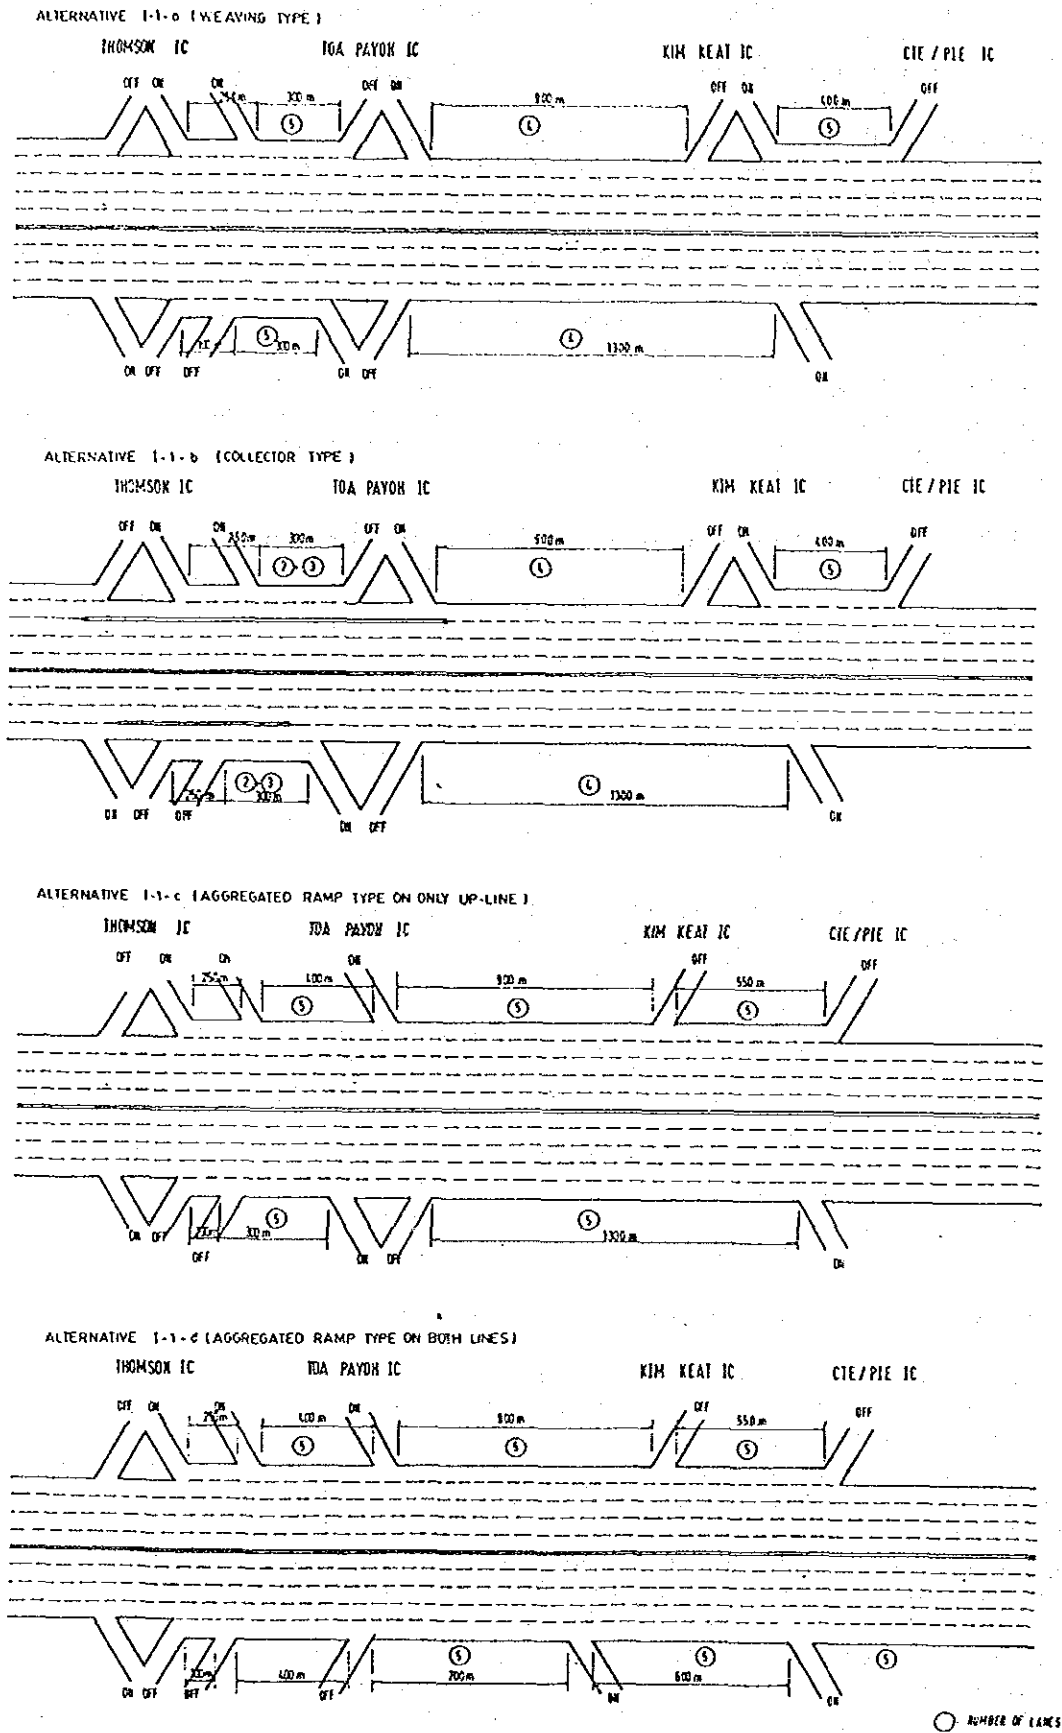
Alternative on the PIE section from Thomson IC to PIE/CTE IC (At-grade widening)
